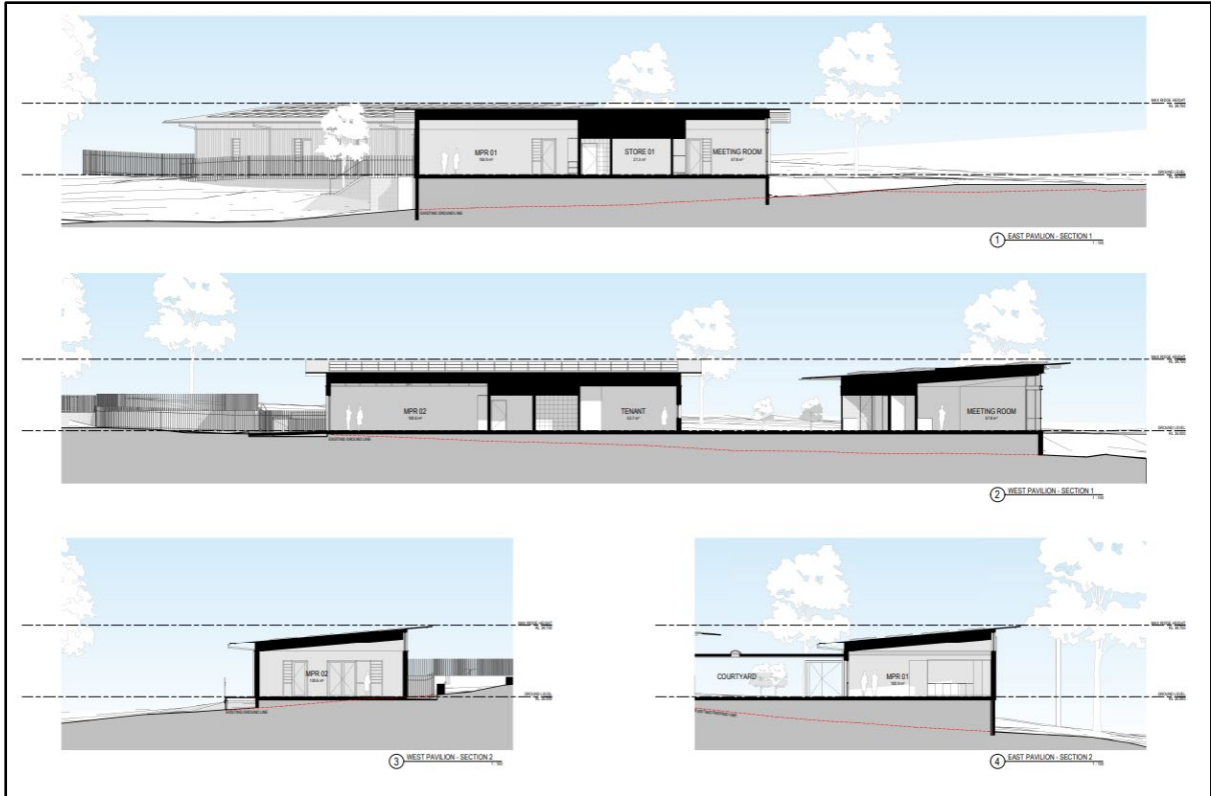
Sections. Source: AJC Architects 23 April 2024.
